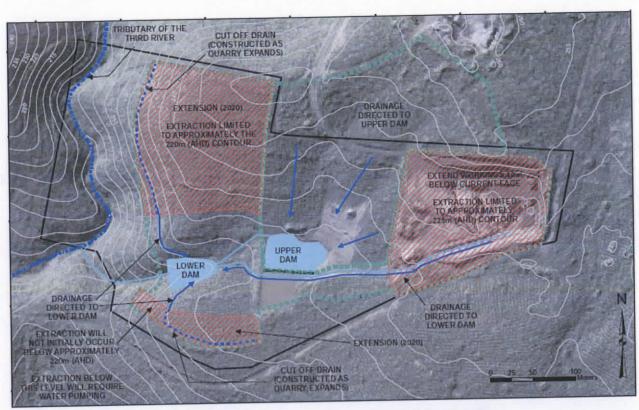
Proposed drainage and extraction plan (Figure 4-2-1 of the DPEMP)
